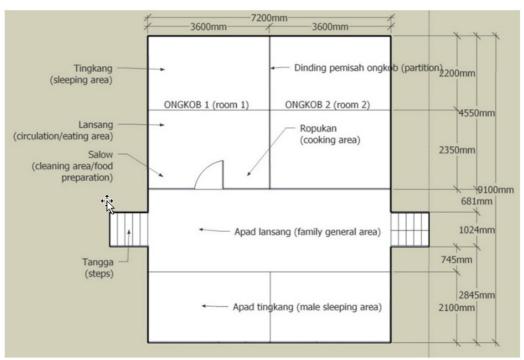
Breakdown of the typical valai floor plan for ongkob (rooms) Source: Personal
